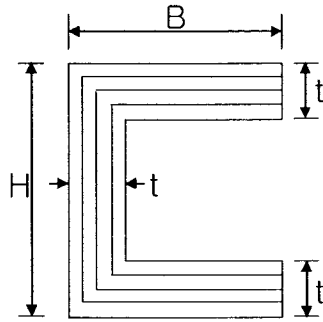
Cross section of the laminated composite channel beam.
